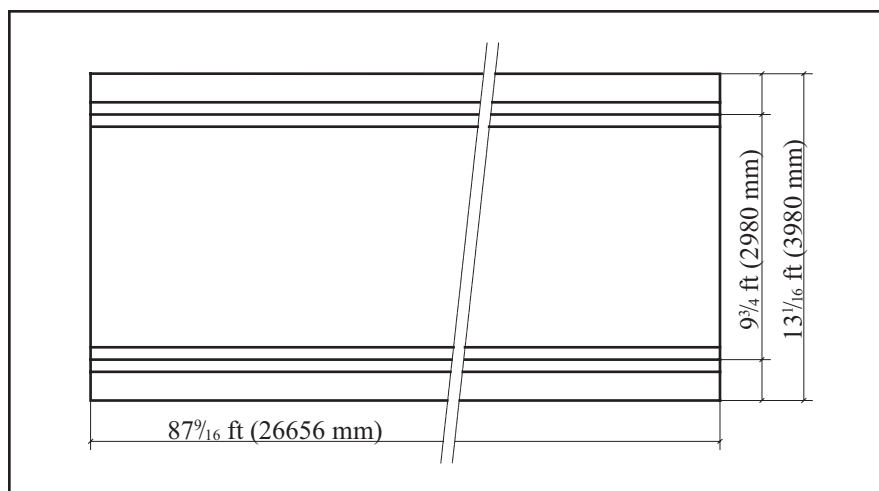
Plan view of simplified length of U-shaped deck with span of $87\frac{9}{16}$ ft (26.65 m).
